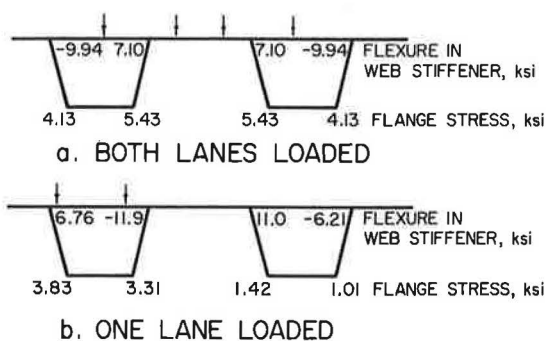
Stresses from highway loadings in steel box girder without interior diaphragms.
